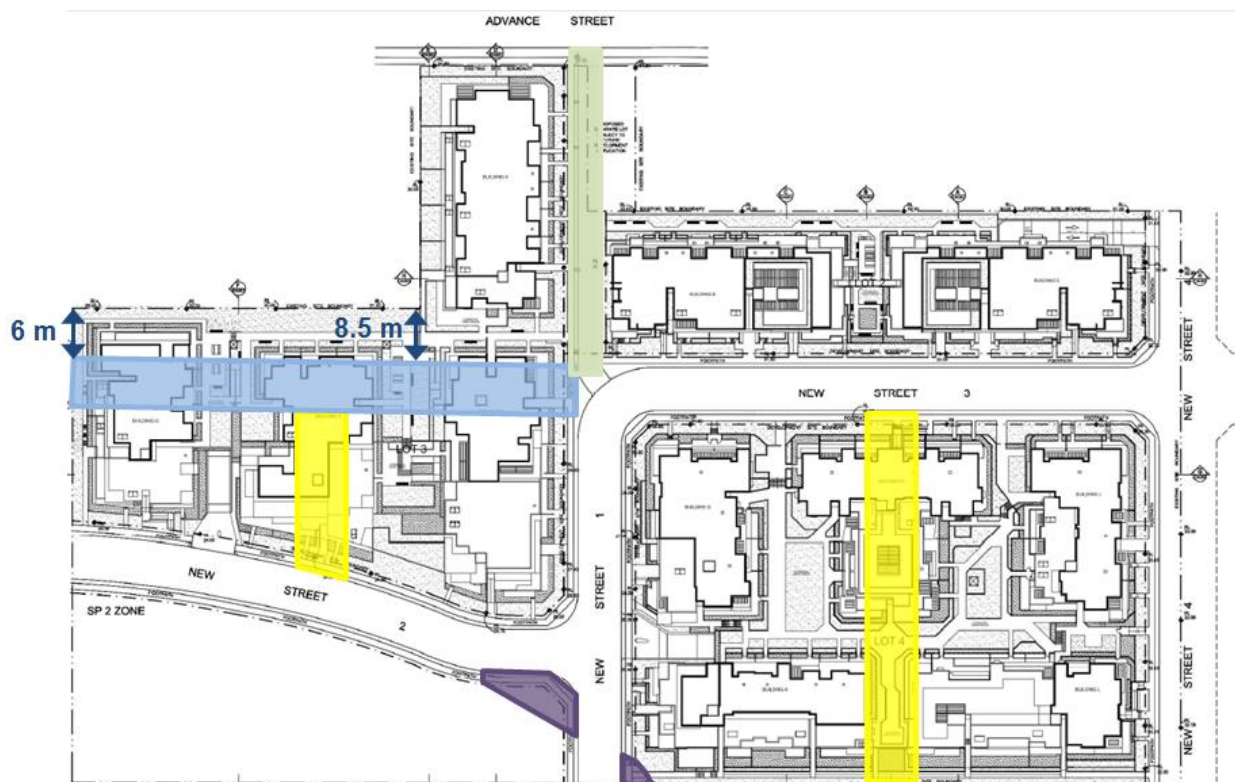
Extract from the proposed Ground Floor Plan, as lodged, which is not consistent with the ILP. 2 north-south roads were proposed to be deleted (shown in yellow). 1 east-west road was proposed to be re-aligned further to the north to meet the property boundary shared with 18
